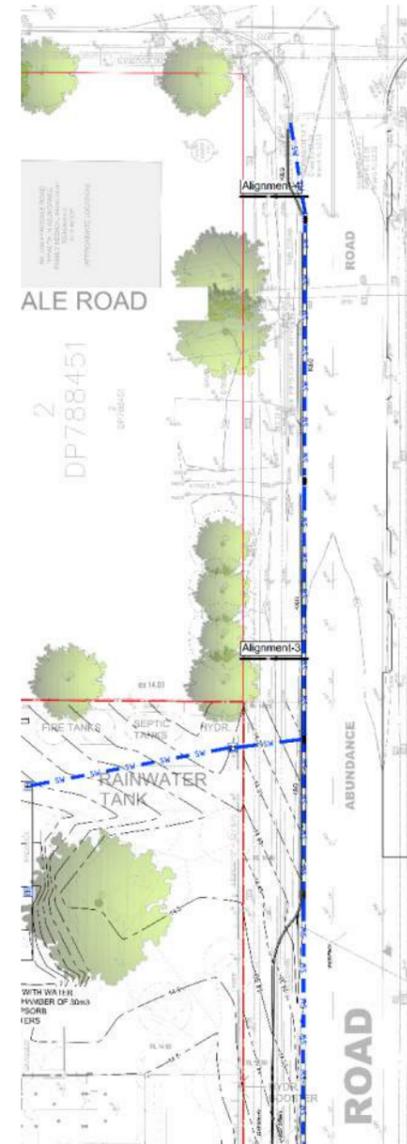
Proposed Stormwater on Abundance Road shown with blue dashed line
